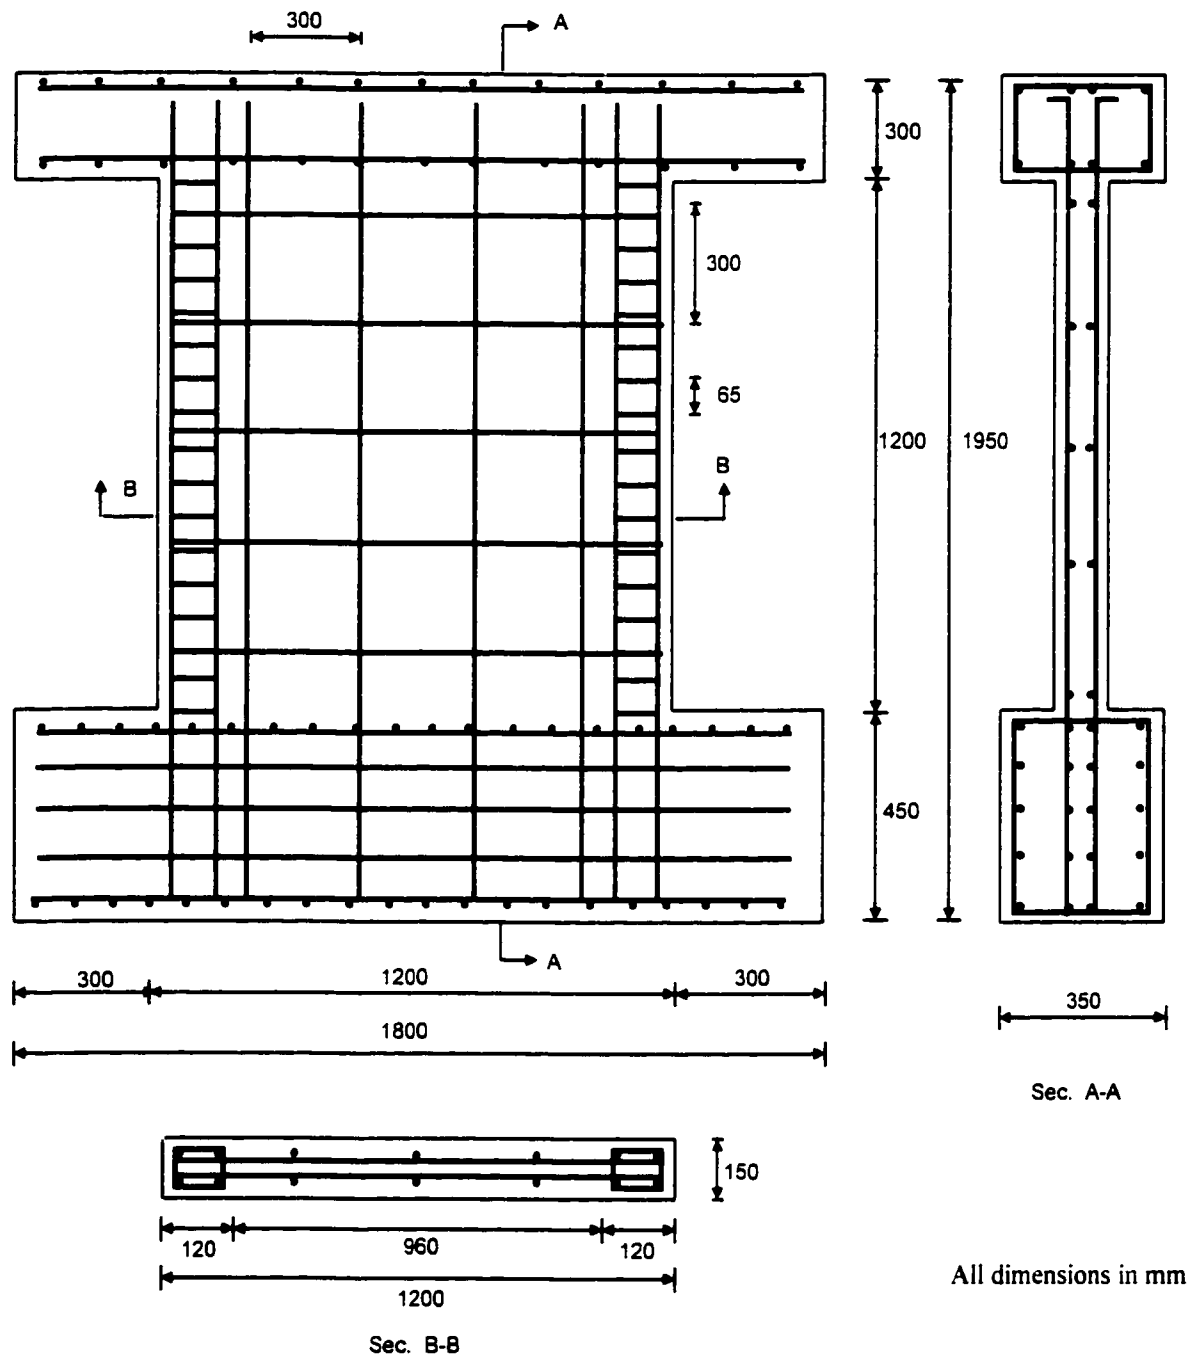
Geometry and reinforcement details of shear wall N2
